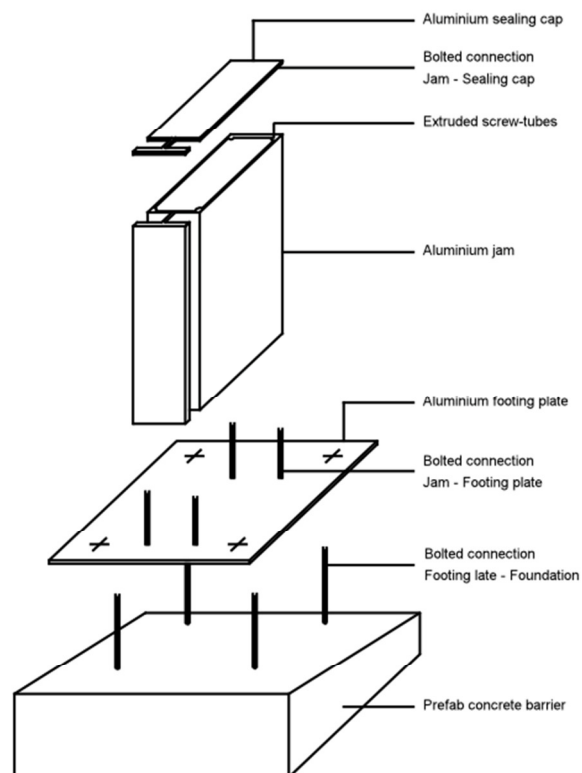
Design 5, Aluminium top element + Aluminium footing plate
